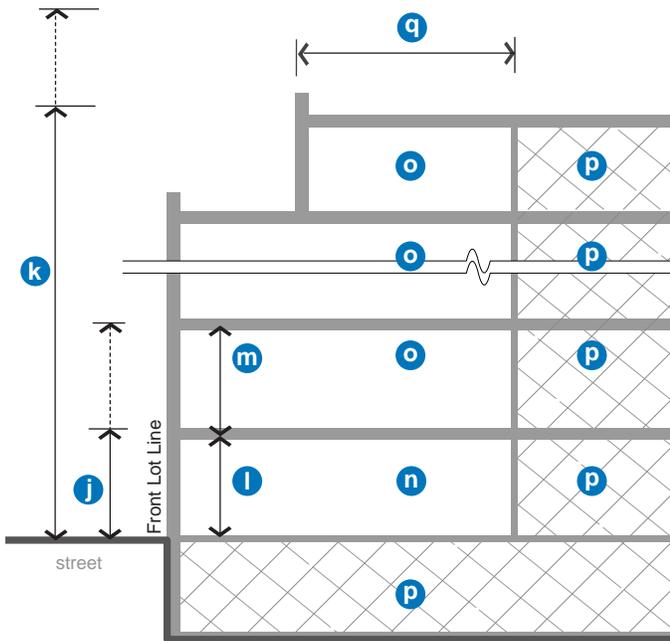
(2). Limited Bay Building: Height & Use Requirements.
